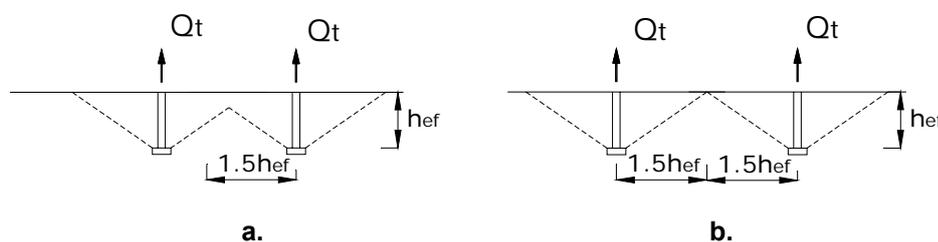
a) Group effects of anchors in tension; b) anchors without group effects.
